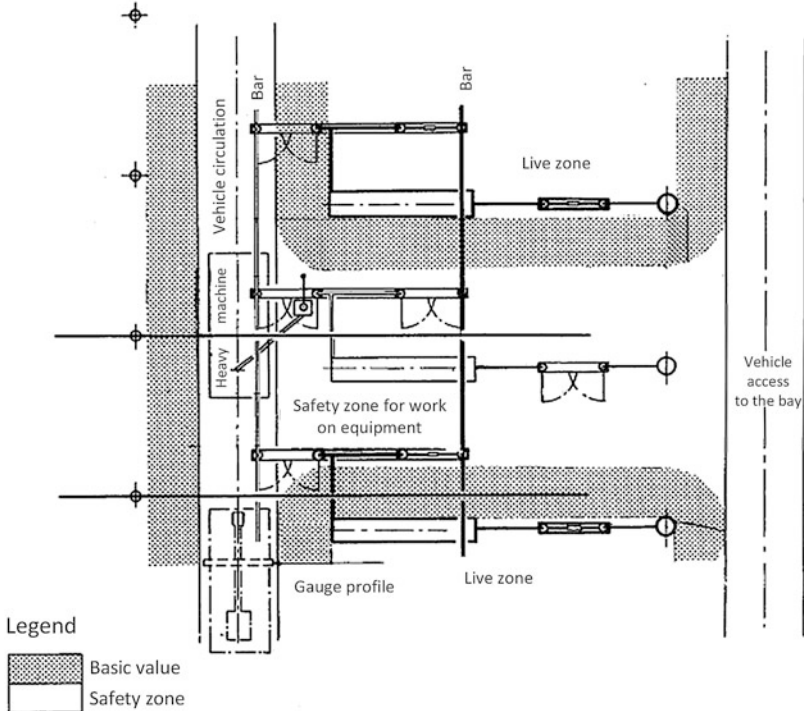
Examples of work carried out using heavy equipment in plant rendered inaccessible by distance
